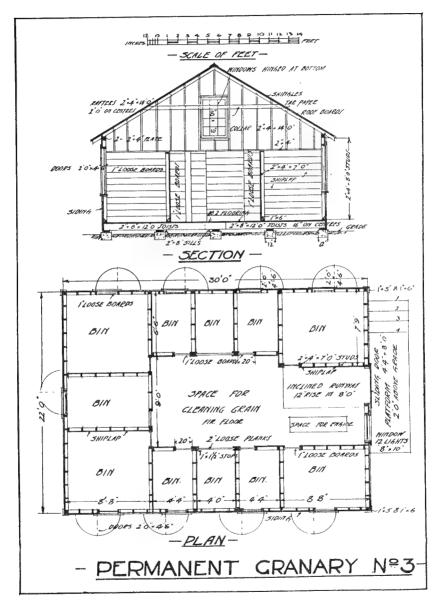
All the 11 bins open to the central space as well as to the outside. The central space can also be used for storing grain.
